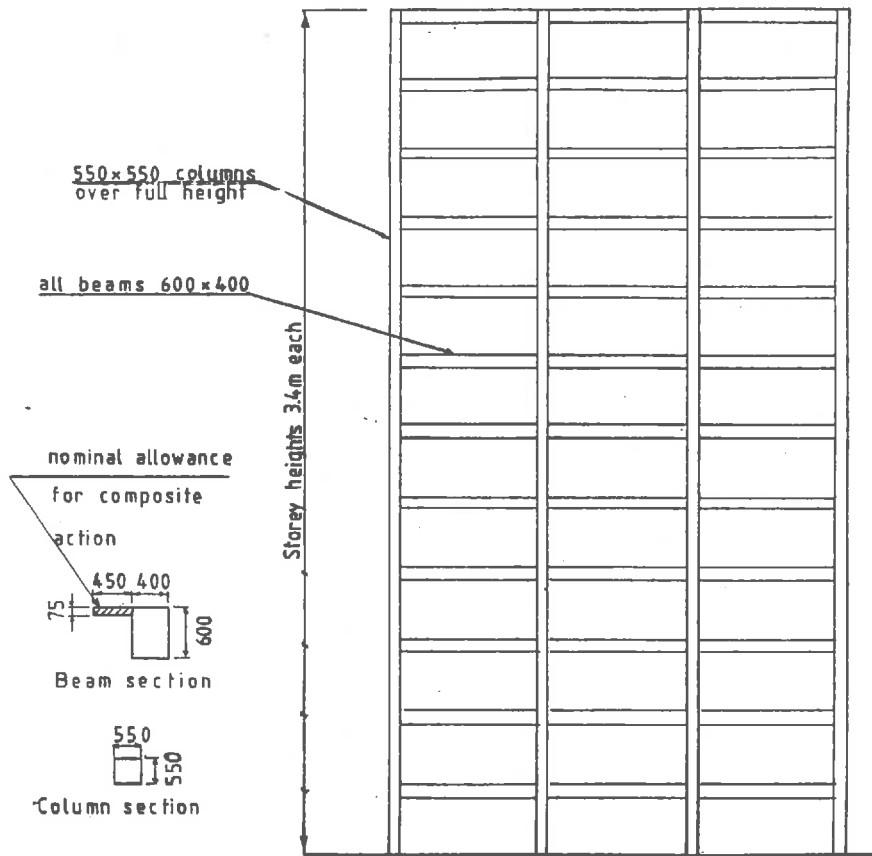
Typical Elevation of Frame and Beam Sections
